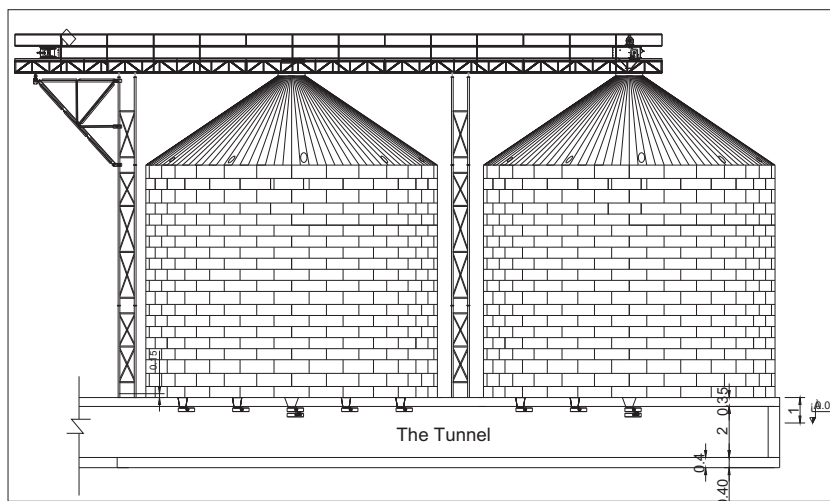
A sectional elevation for tunnel and silos used in the case study.
